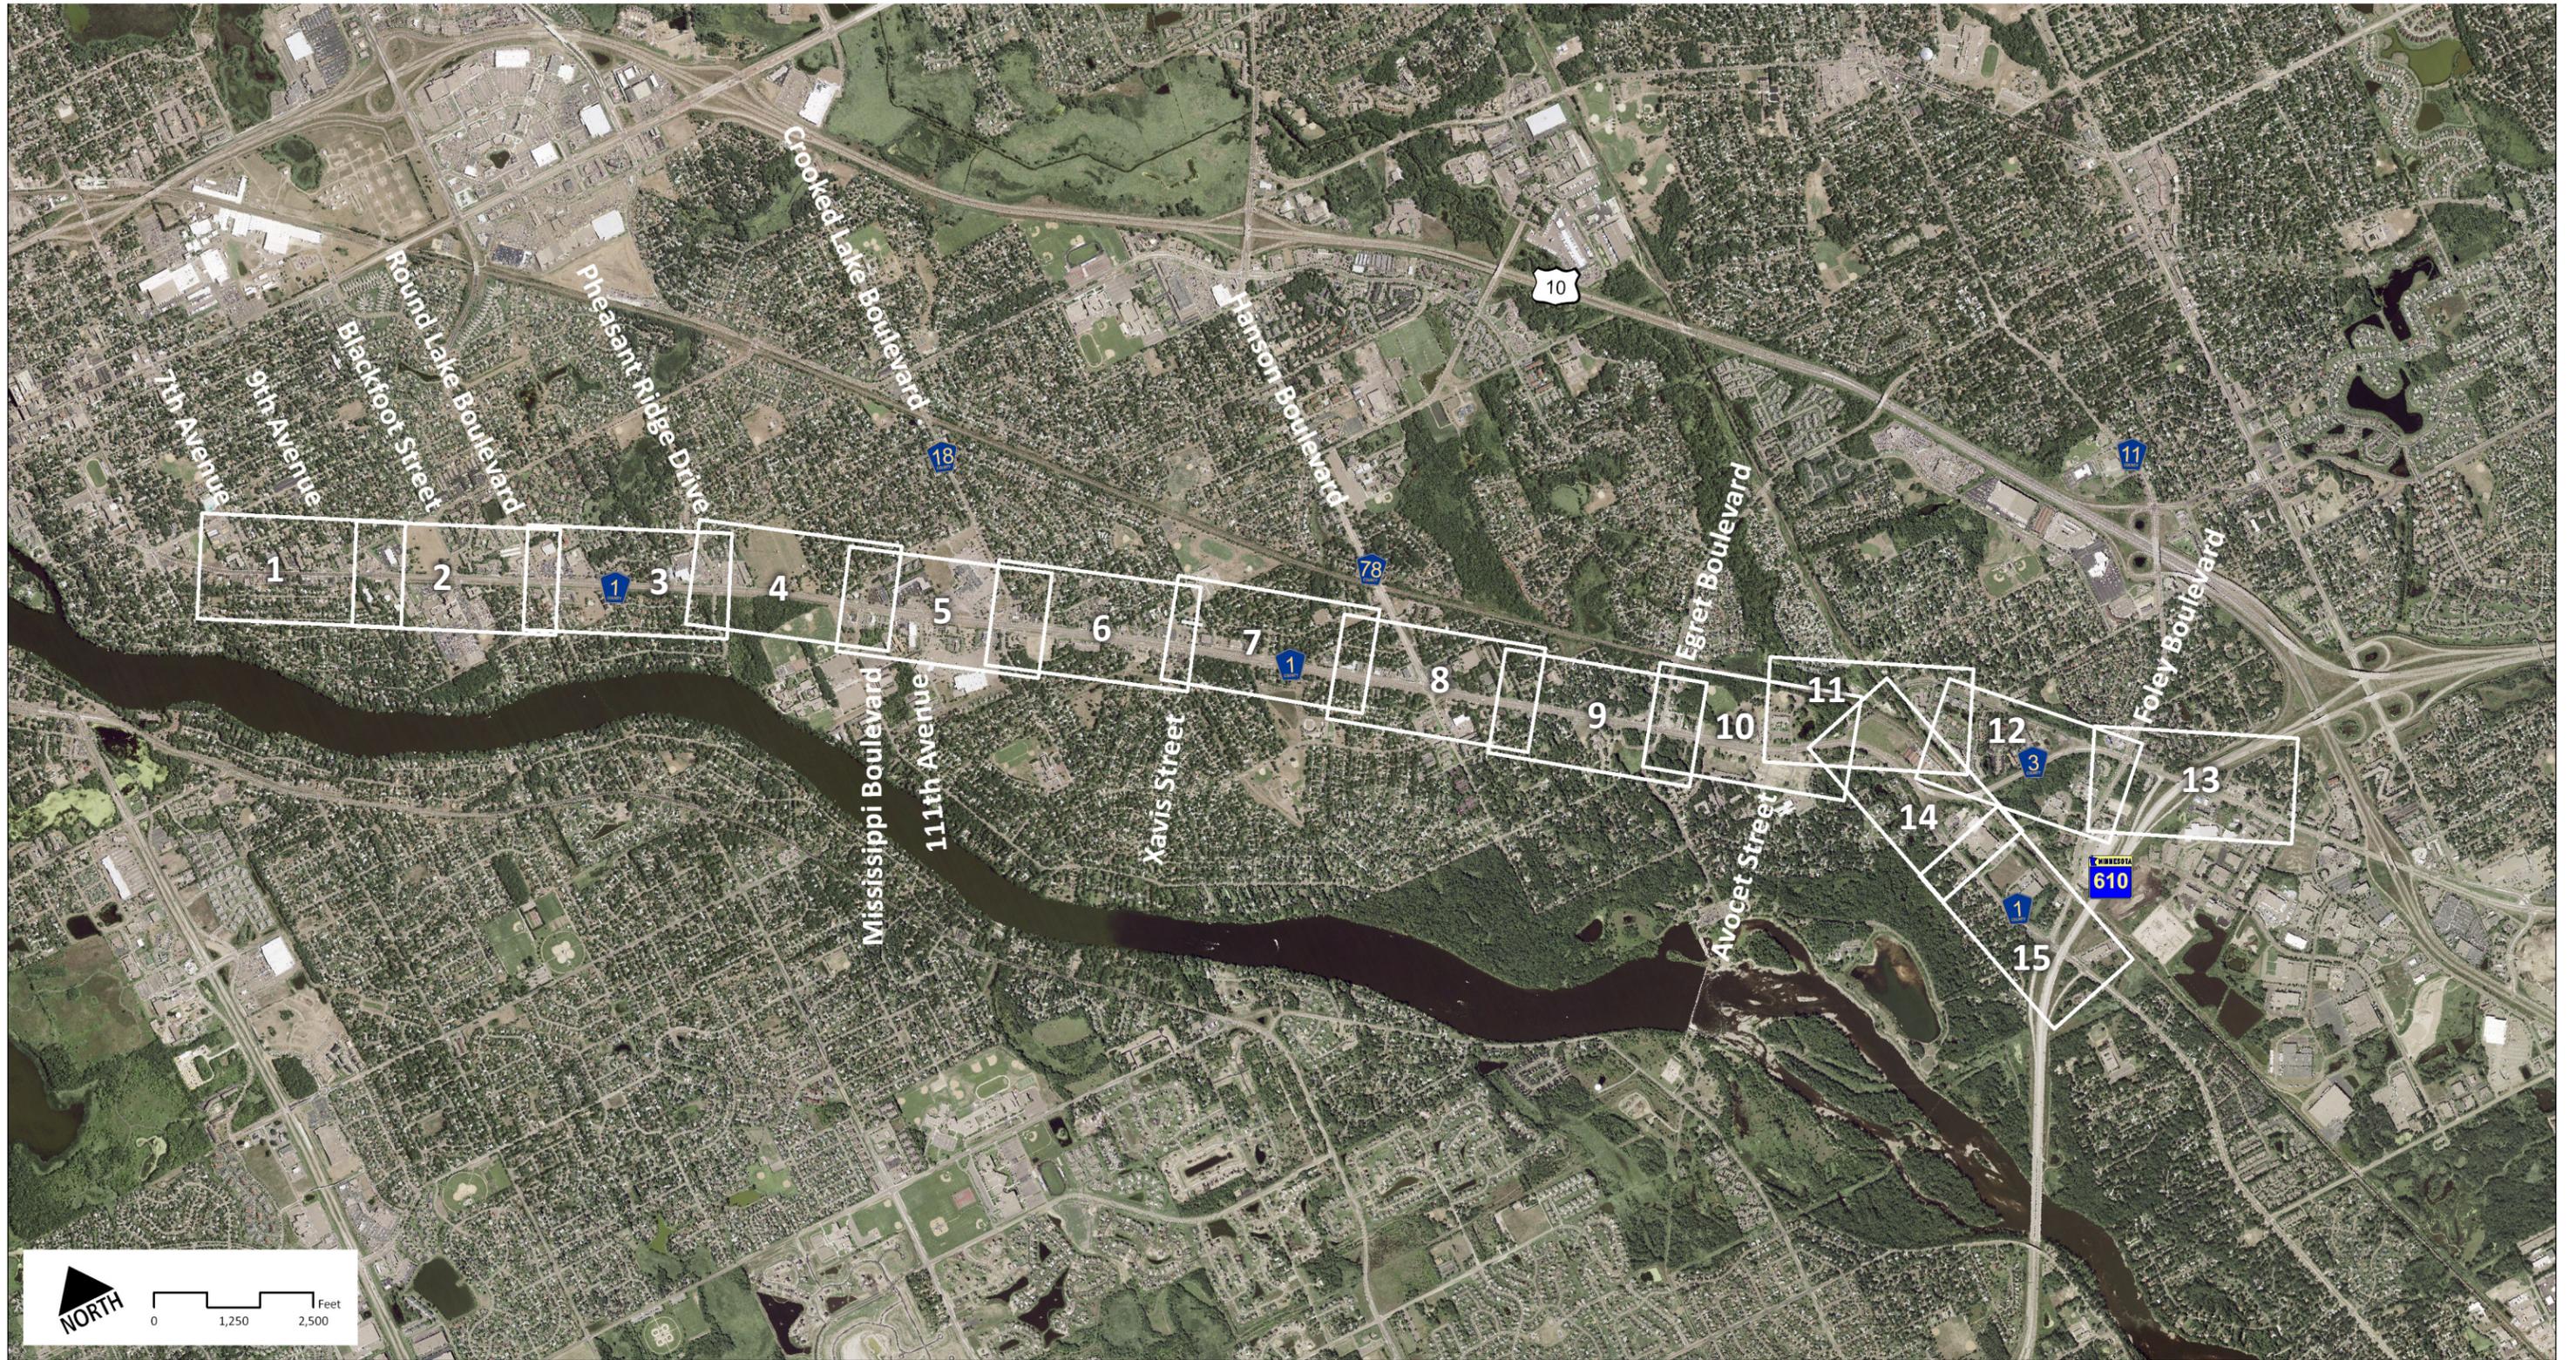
Proposed Roadway Recommendations Detail (Index)
